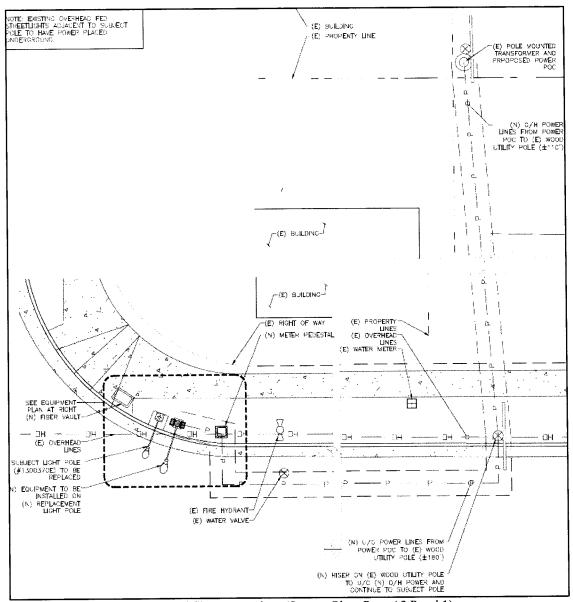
Underground power and fiber connections (Source: Plans Page A2 Panel 1).
